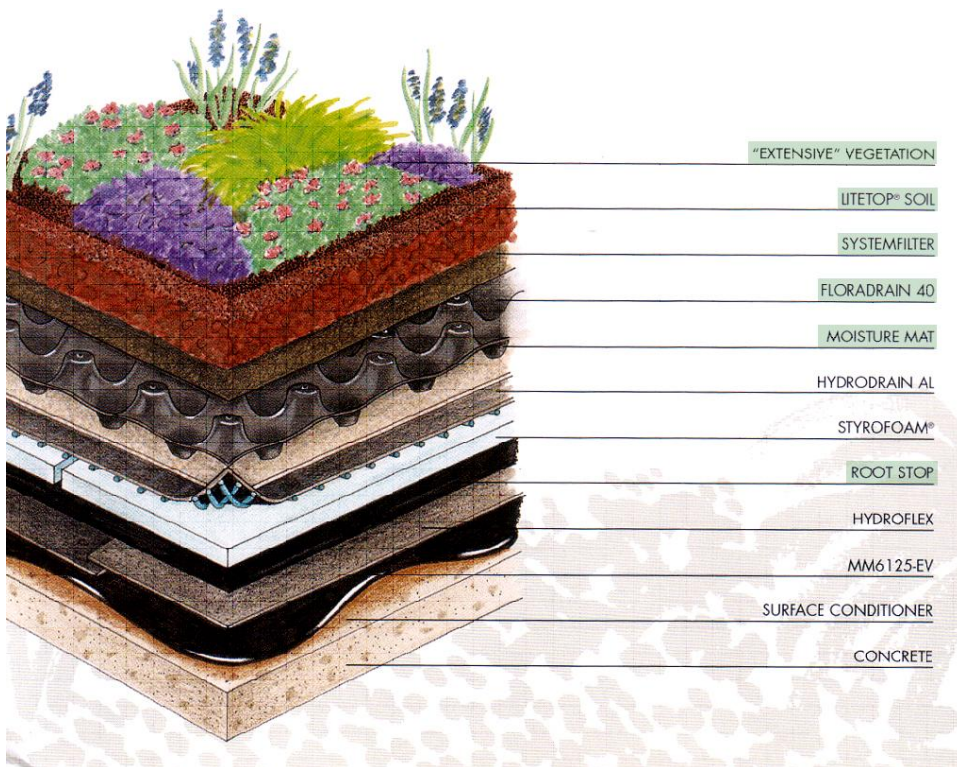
Hydrotech Garden Roof Assembly. Layers shaded green were used for UT-Arlington installation
